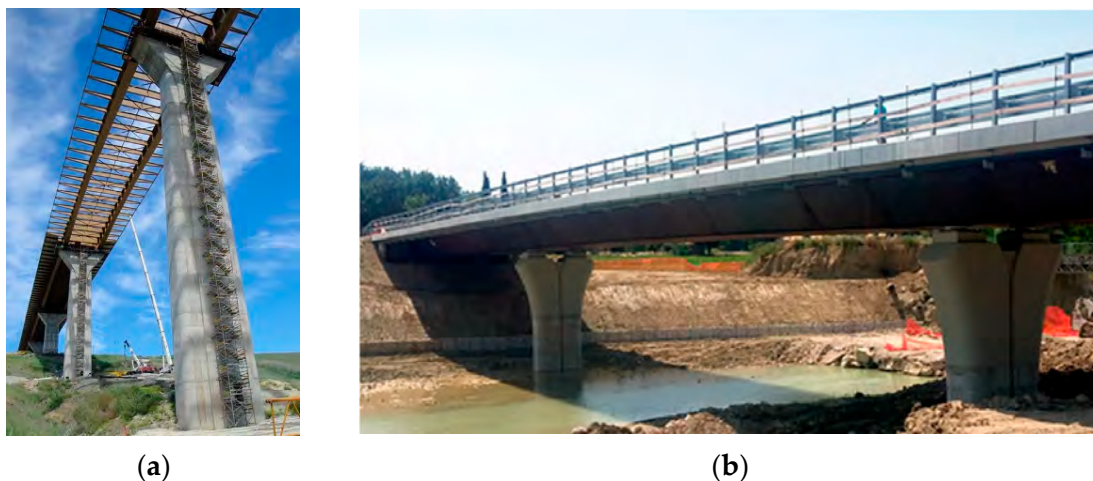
Examples of steel–concrete bridge decks: (a) continuous twin-girder multi-span viaduct-Serra Cazzola viaduct, AG, Italy; (b) continuous box-girder multi-span bridge on the Cesano River, at Mondolfo, PU, Italy.
